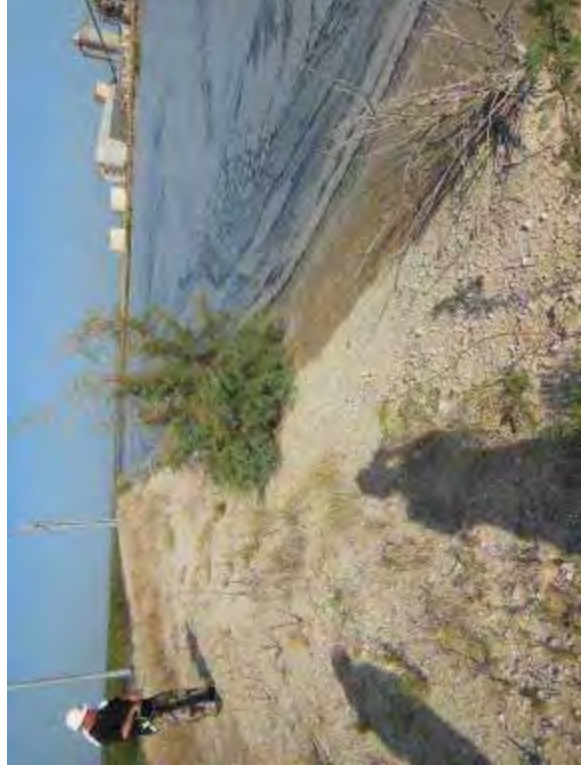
South embankment interior slope, looking west. Note typical vegetation.
